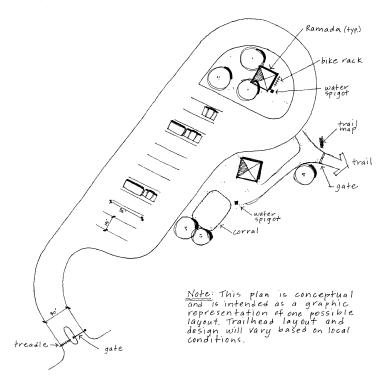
TRAIL ACCESS FACILITY CONCEPT
